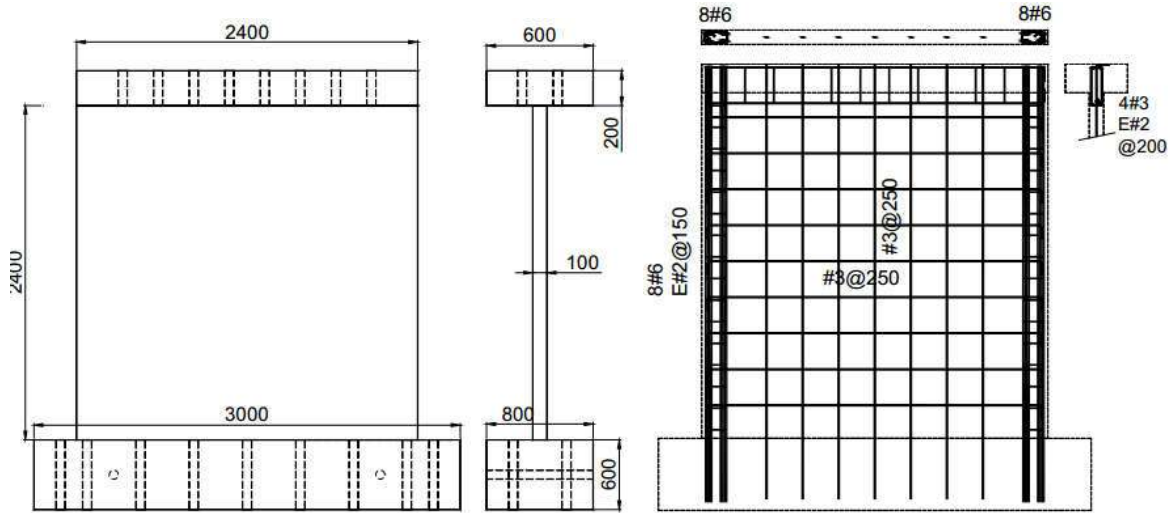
Geometric dimensions and reinforcement of wall MCN100C
